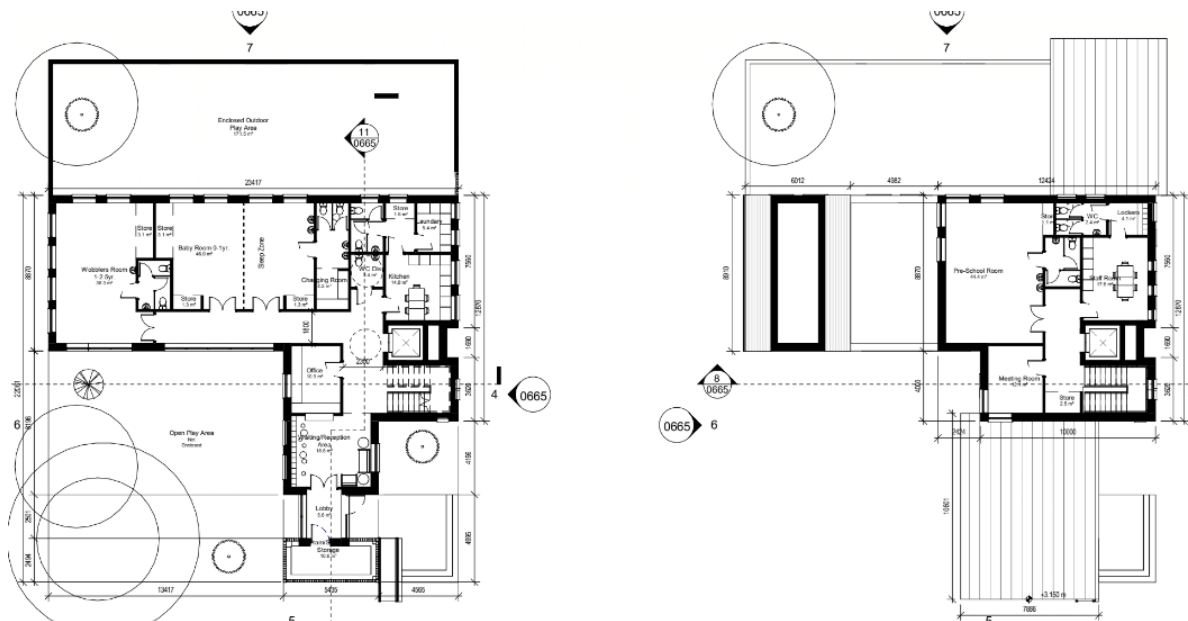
Ground (left) and first (right) floor plans of the proposed Flemington Park Creche unit.
